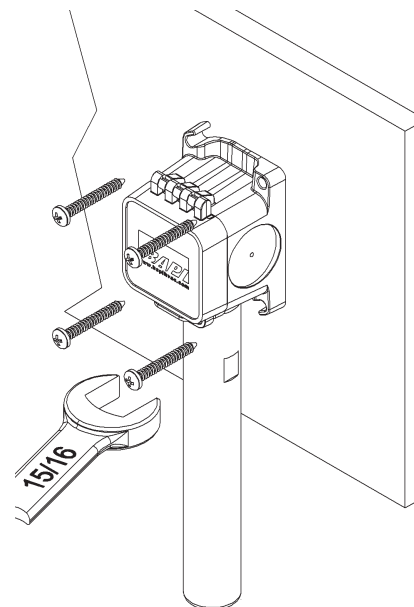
Thermobuffer in a BAPI-Box Crossover Installation
